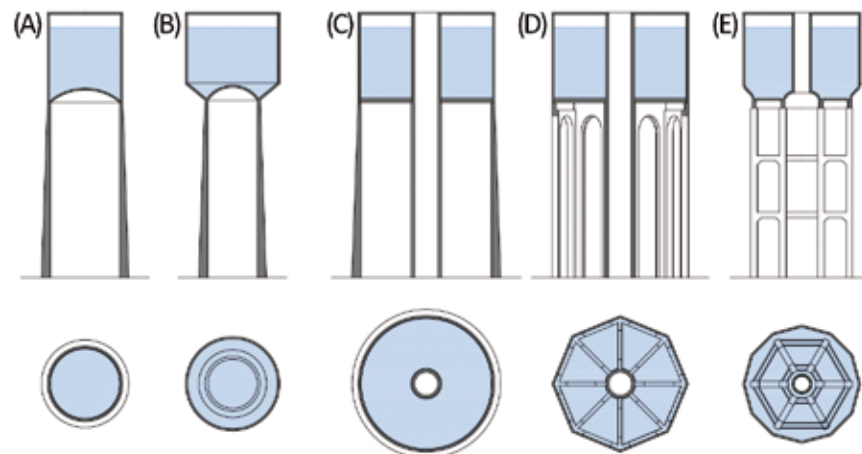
Examples of construction solutions of water tanks with reinforced concrete structure: (A) cylindrical below the perimeter of the cistern, (B) cylindrical on a foundation wall (Intze-type), (C) cylindrical, peripheral and shaft on a double foundation wall, (D) on radial walls – solid or with openings, (E) on several pillars. Diagram by Radek Mišanec, 2021 (modified according to: Klír and Klokner, 1923).
